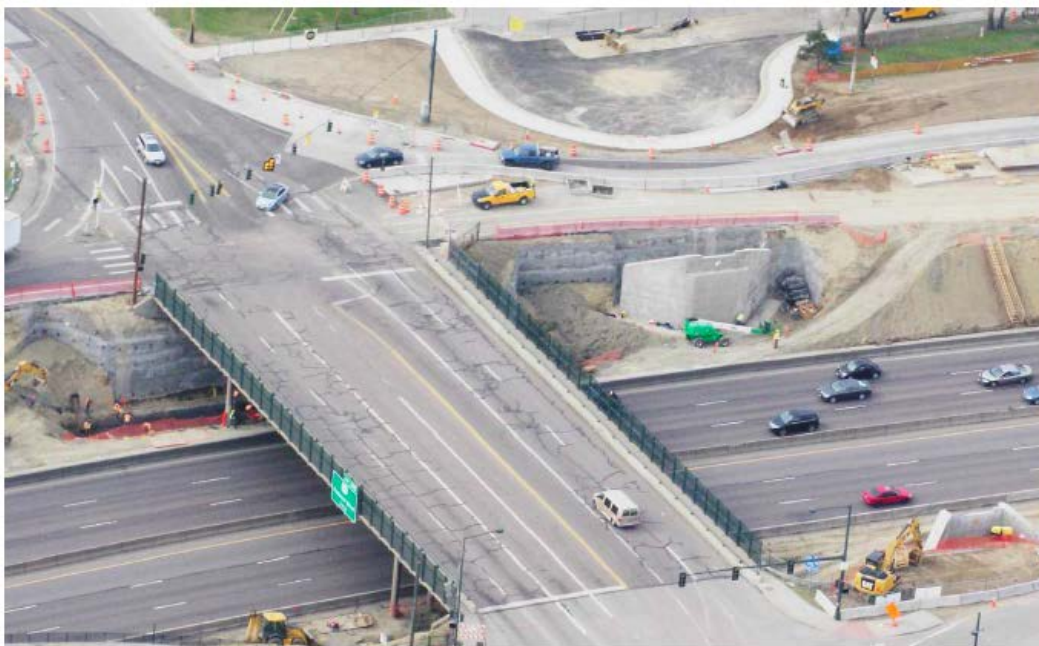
Photo. Substructure work being performed on vehicular and pedestrian bridges (courtesy: Colorado DOT).
